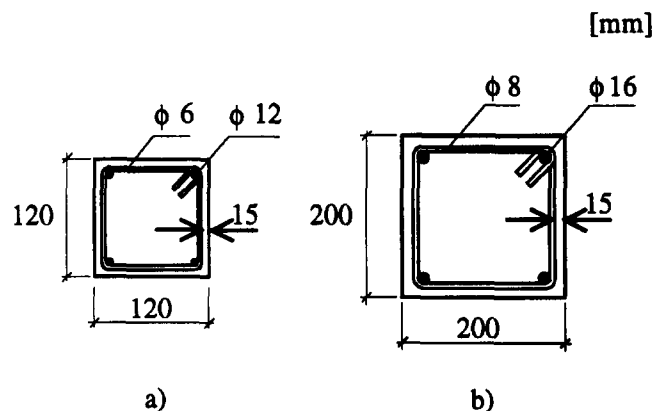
Concrete Columns: Geometry and Details of Configurations (a) and (b)
